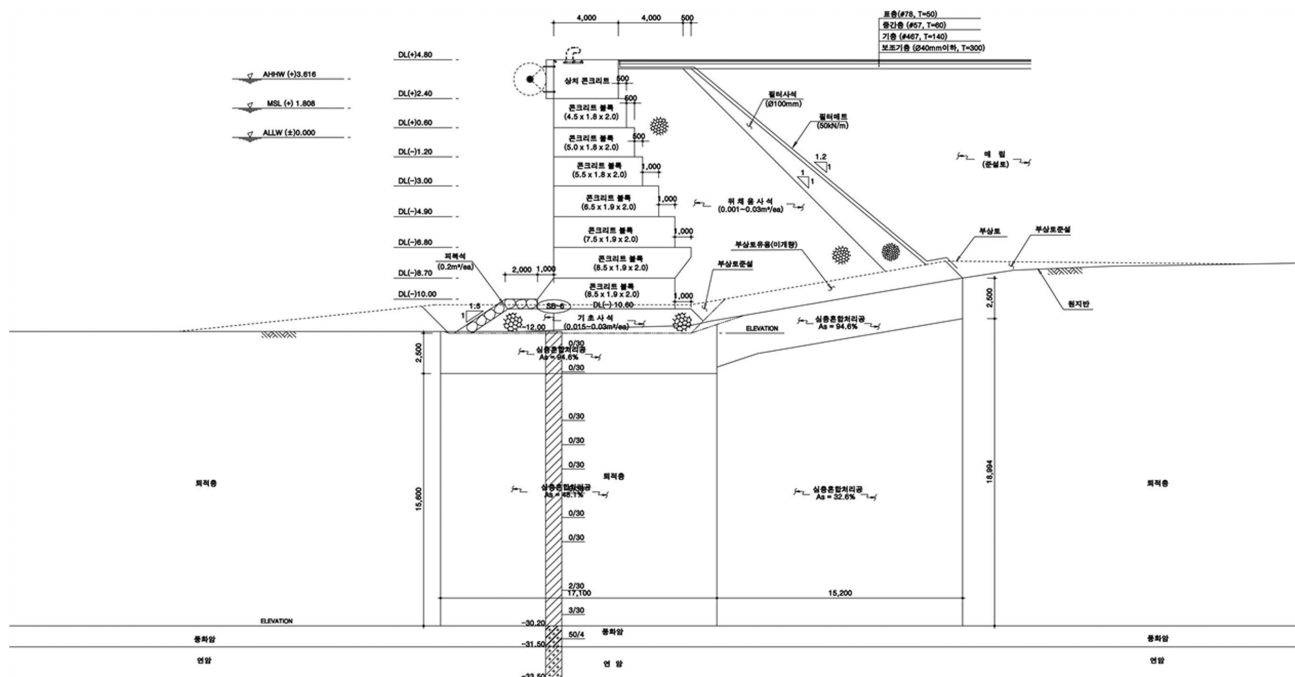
Section plan (○○ New port cruise pier expansion construction (Quay wall)).
